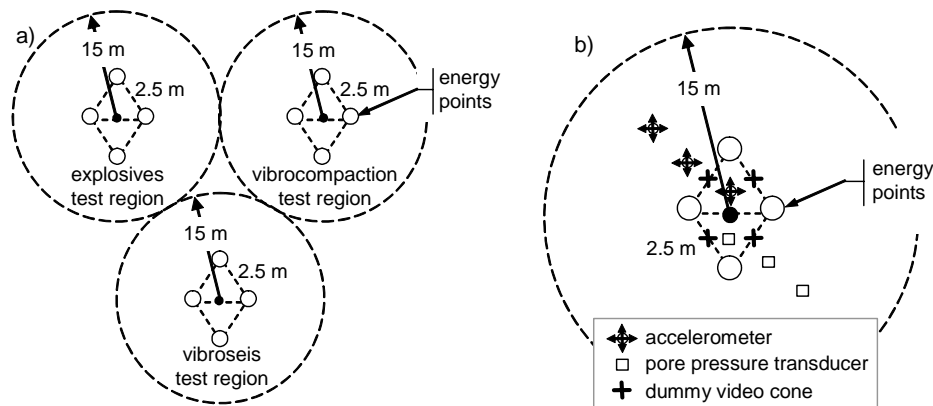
a) Example plan view of the site test layout, and b) Example plan view of the instrument layout within a given test region. The "energy points" are the location where liquefaction will be induced via vibro-compaction, explosive compaction, or using the vibroseis.
